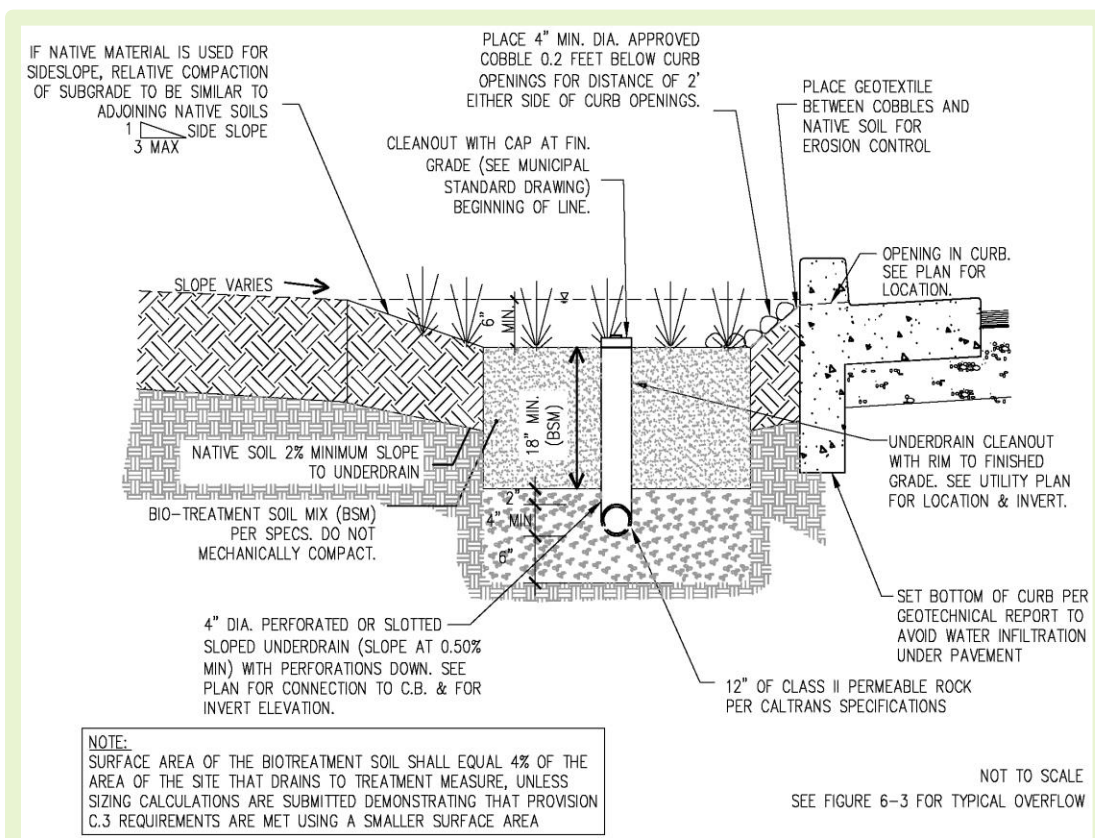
Cross-section of bioretention area with infiltration showing inlet from pavement.
